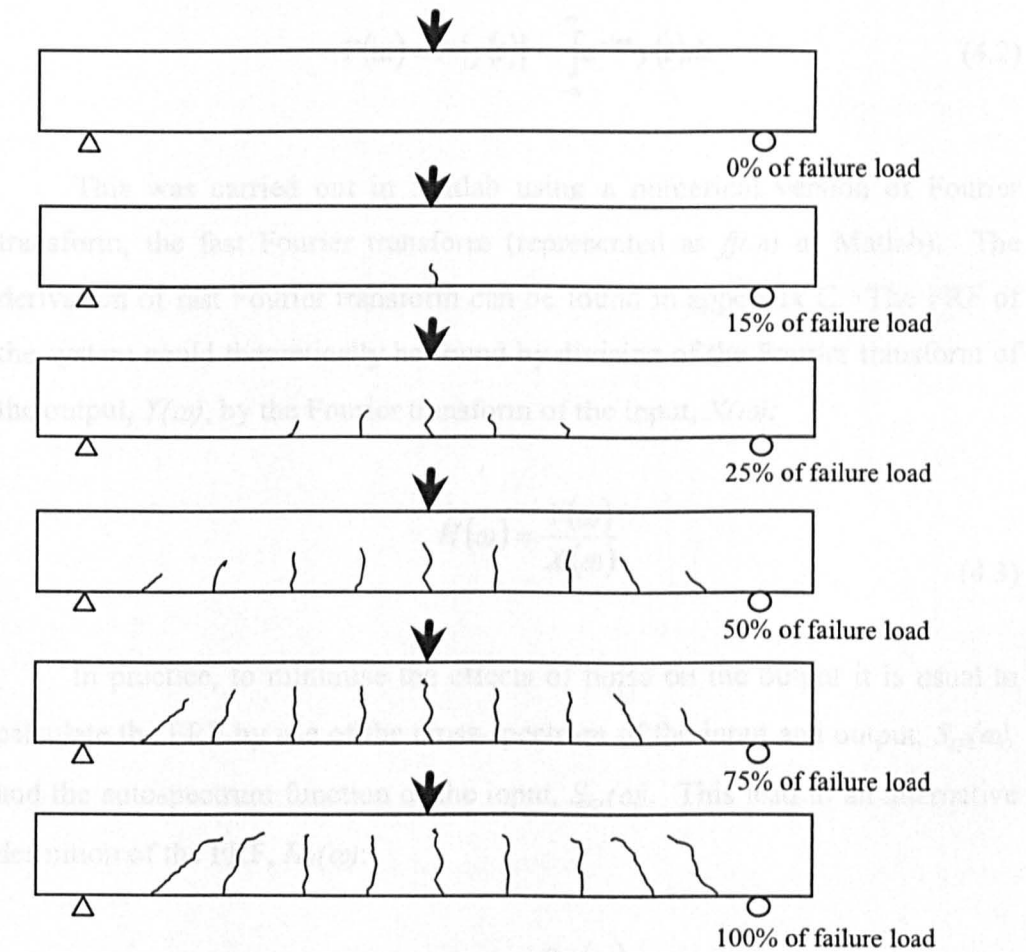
Development of cracks for reinforced concrete beam 4
